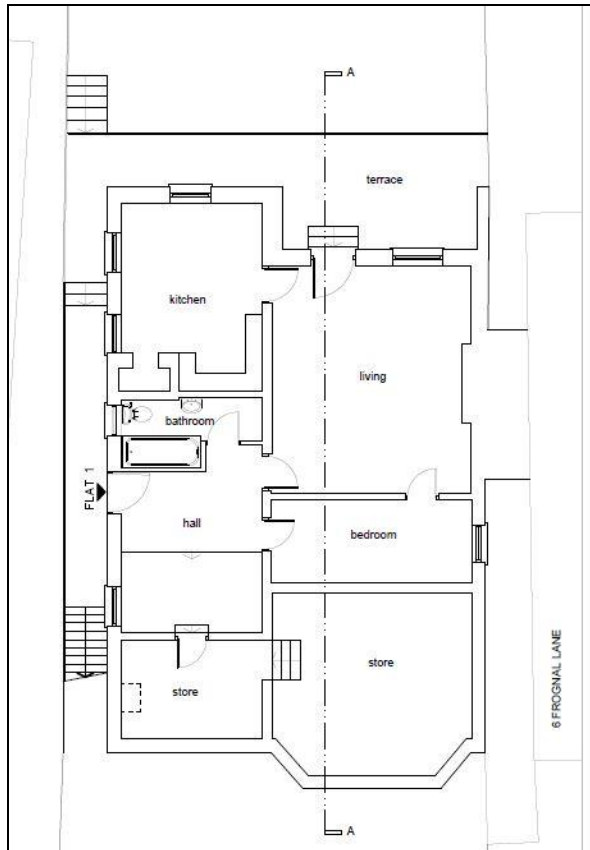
Extract from drawing 7395/ 100B Existing Plan
